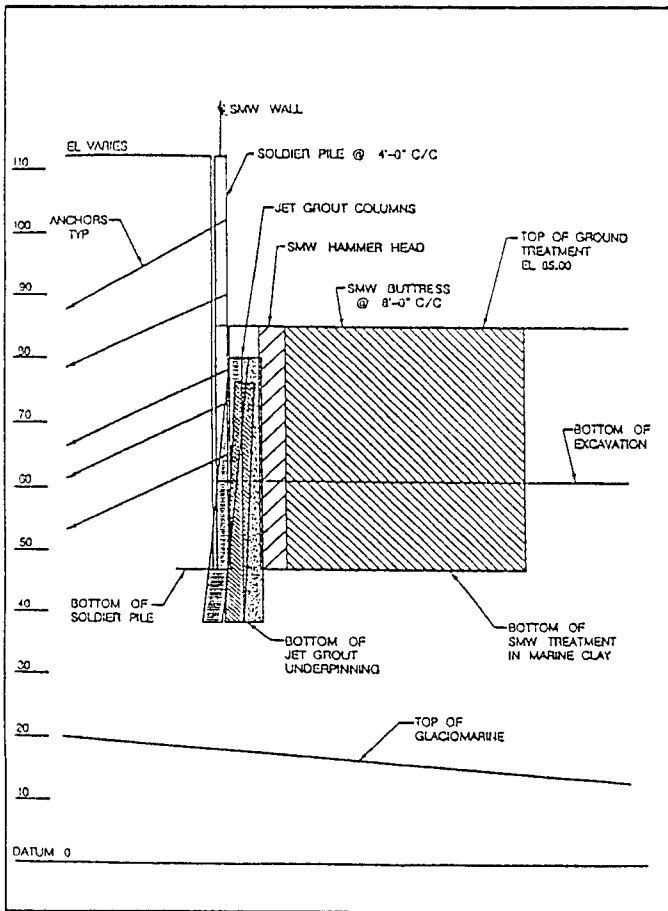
Typical "Floating" SMW buttress, West Wall, Zone C. (Dimensions in feet; 1 foot = 0.3048 m). (Nicholson and Chu, 1994).
